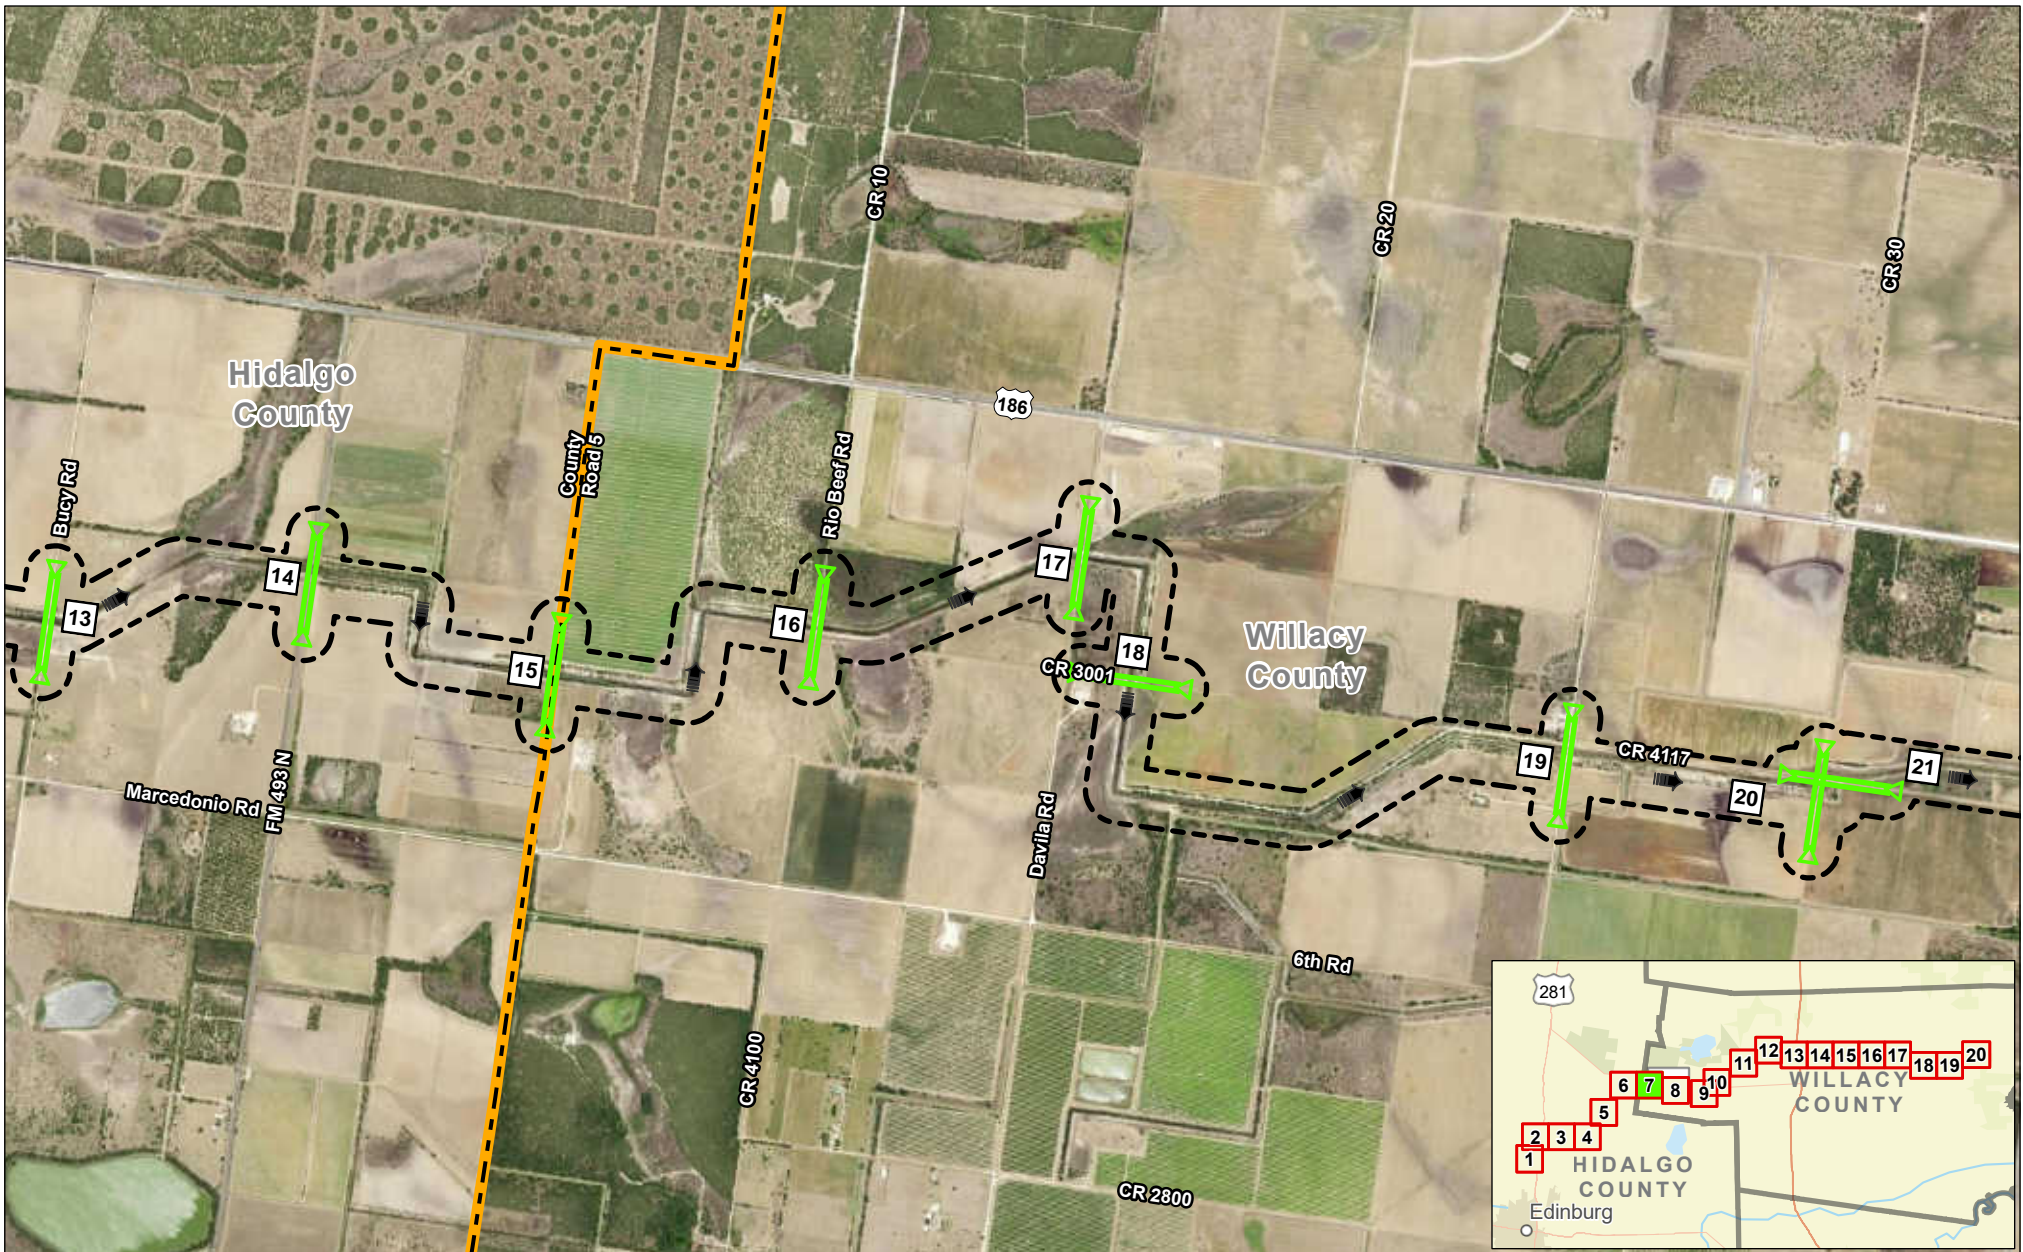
Alternative 1 Existing and Proposed Crossings Sheet 6 of 20 Raymondville Drain Project
